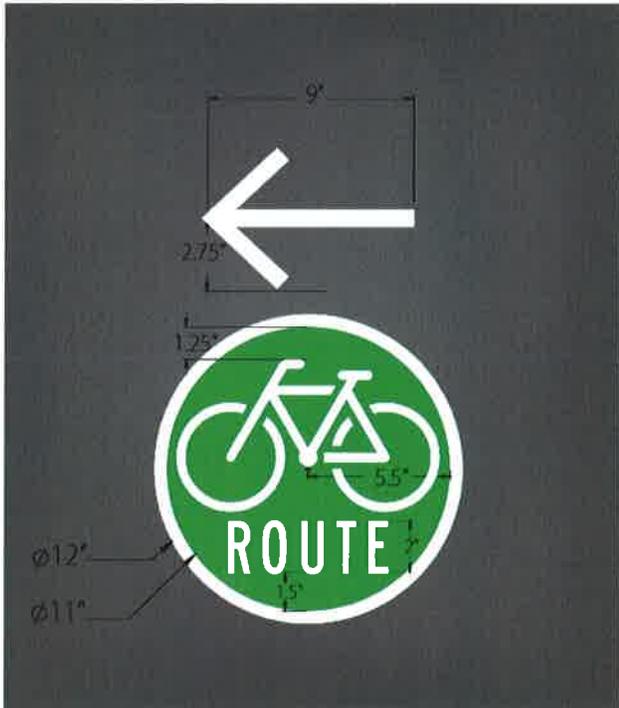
Proposed half-size Type 2 pavement marking symbols for off-street facilities
